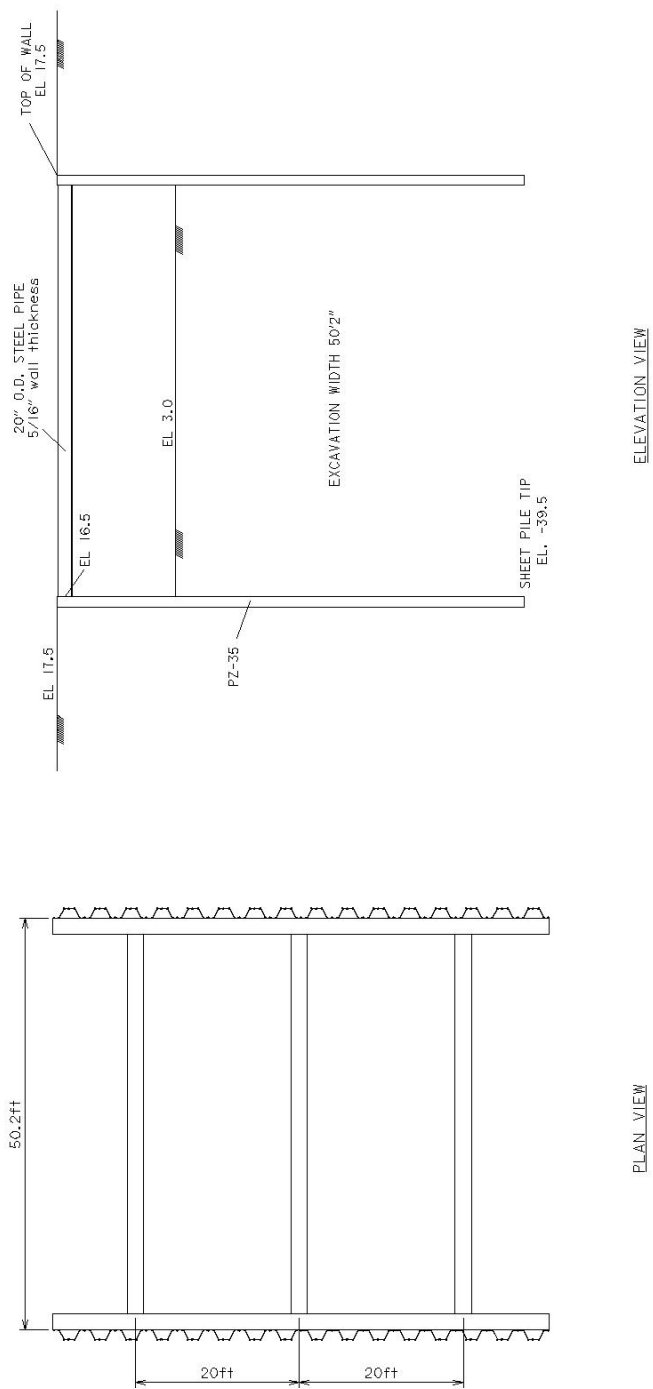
Cofferdam Components Napoleon Avenue Site – Single Strut
